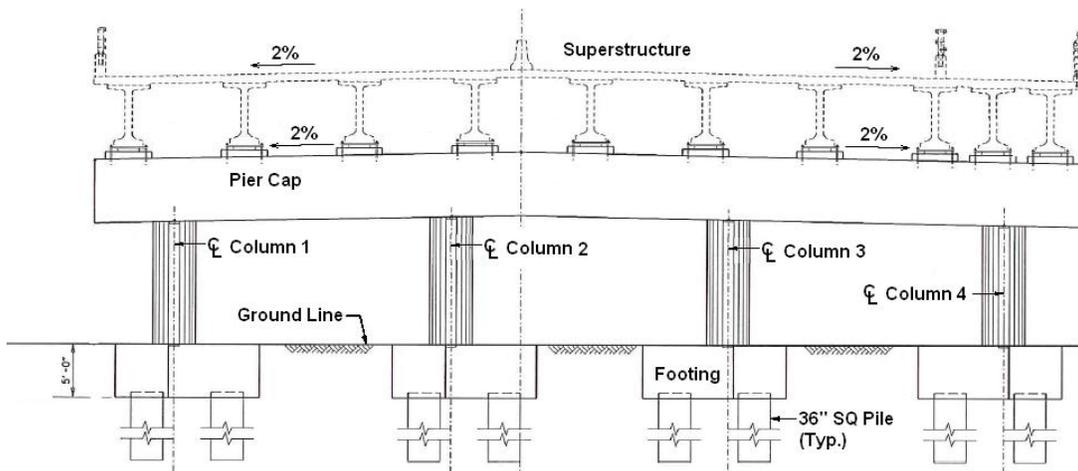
Elevation View of Typical Approach Pier & Foundation
